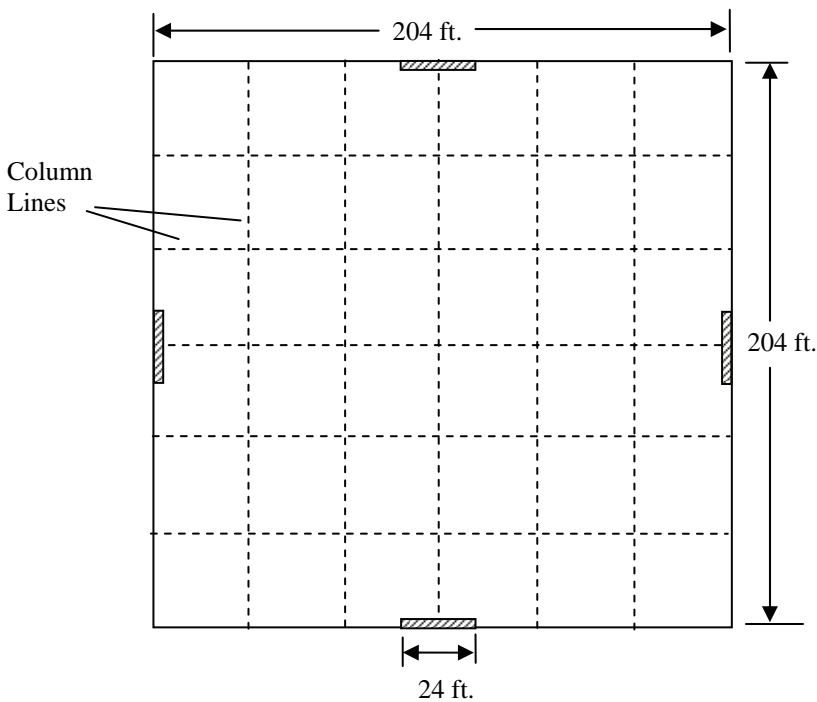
Plan view of typical single-story reinforced masonry shear wall building configuration (design for SDC  $D_{max}$  shown).
